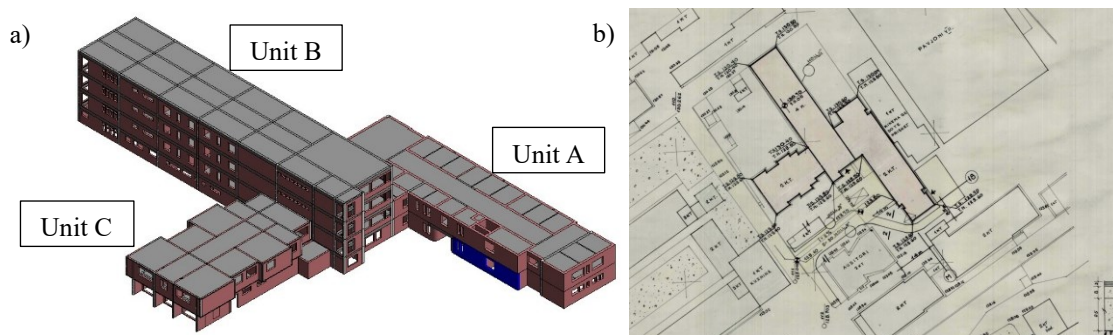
a) The current hospital building in a 3D model; b) Fragment from the original construction project
